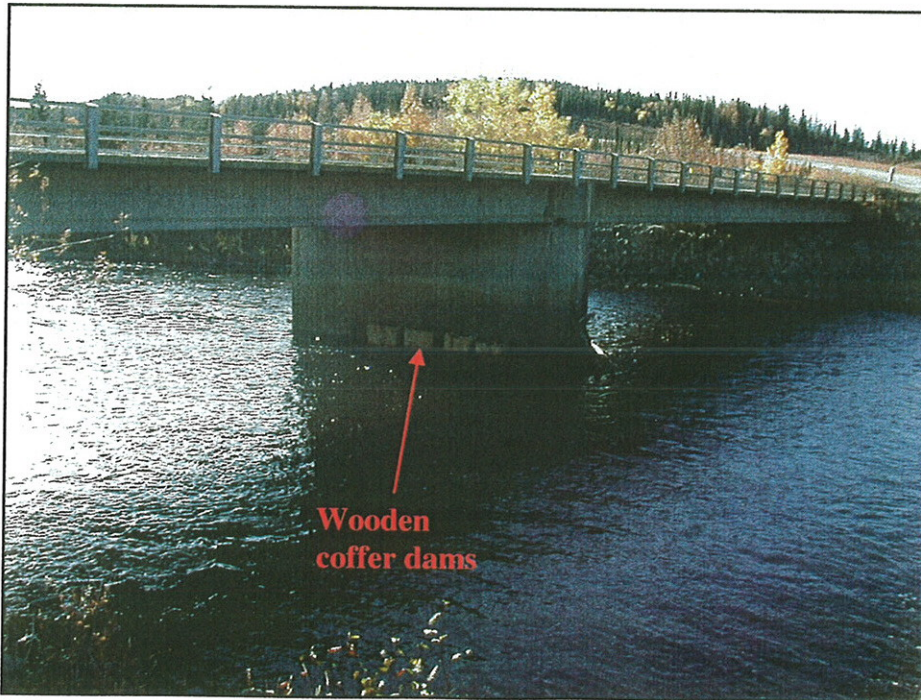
Spalling repair on Mosquito Fork Bridge (2000). A similar technique will be used on the South Fork to repair the concrete on the bridge piers.
